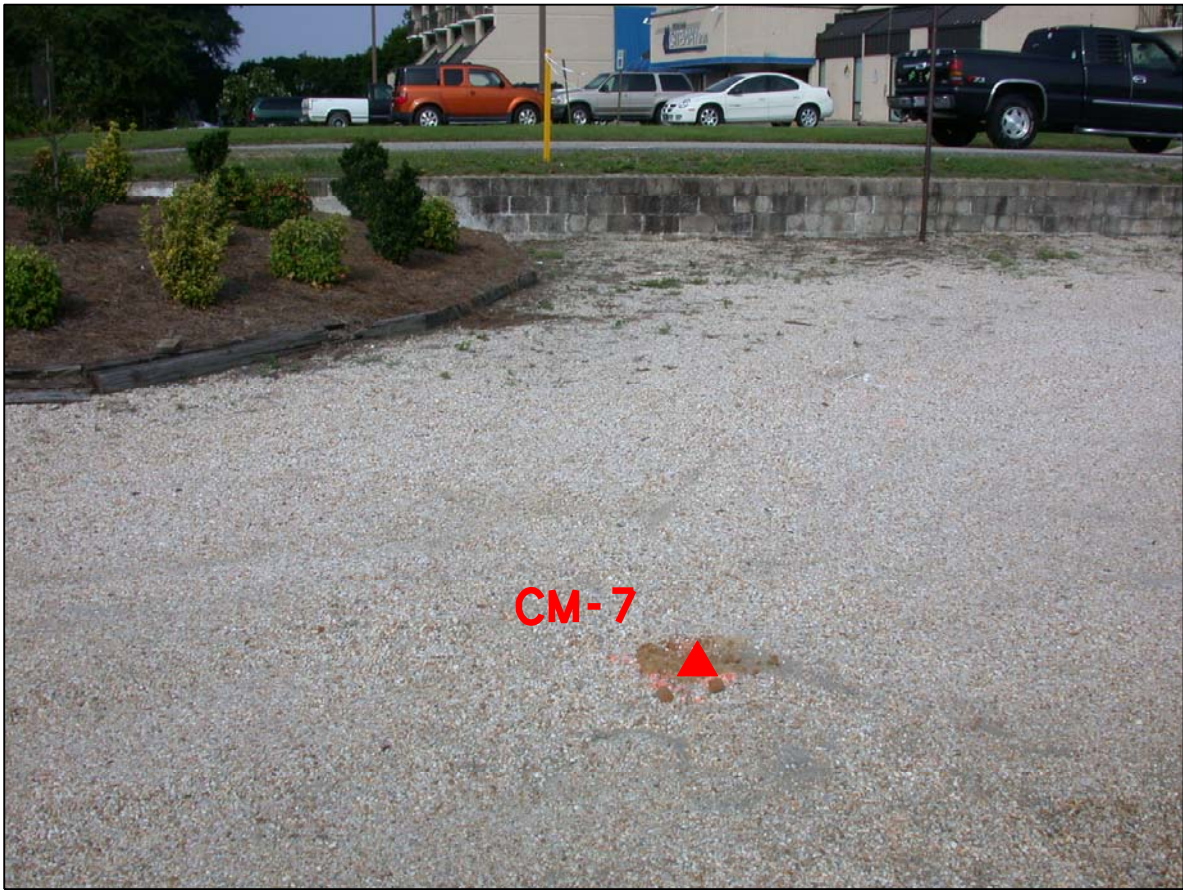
BORING WITHIN PROPOSED R/W LOOKING WEST
